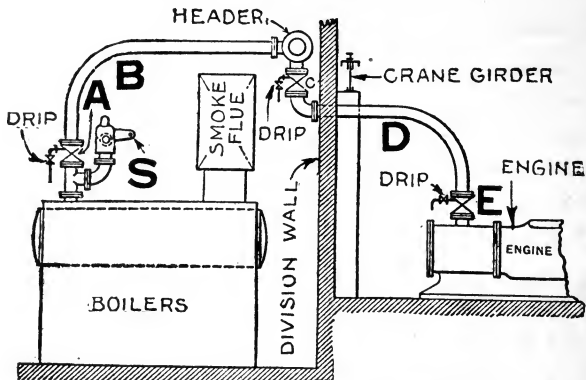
,996.—Objectionable arrangement of piping; it is arranged thus in order to carry the bend D, underneath the crane girder in the engine room. It is objectionable because when gate valve A on any boiler, is closed, bend B will gradually fill with condensate, the column of water being driven over into main when A is reopened. If engine be cut out of service by closing valve E, leaving C open; bend D will fill up with water which will pass into the cylinder when E is reopened. If both E and C, be closed, water will collect in main above C. Whenever a valve forms a water pocket in a steam line, as A, C, and E, the valves should be drained from above the seat.
